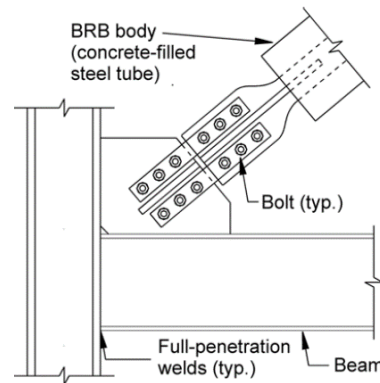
BRB frames connection details: continuous beam, bolted brace
